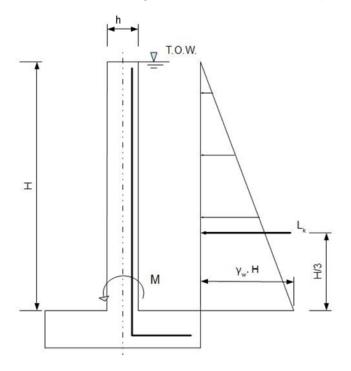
Cross section of wall in circular LRS – tension cracking case
